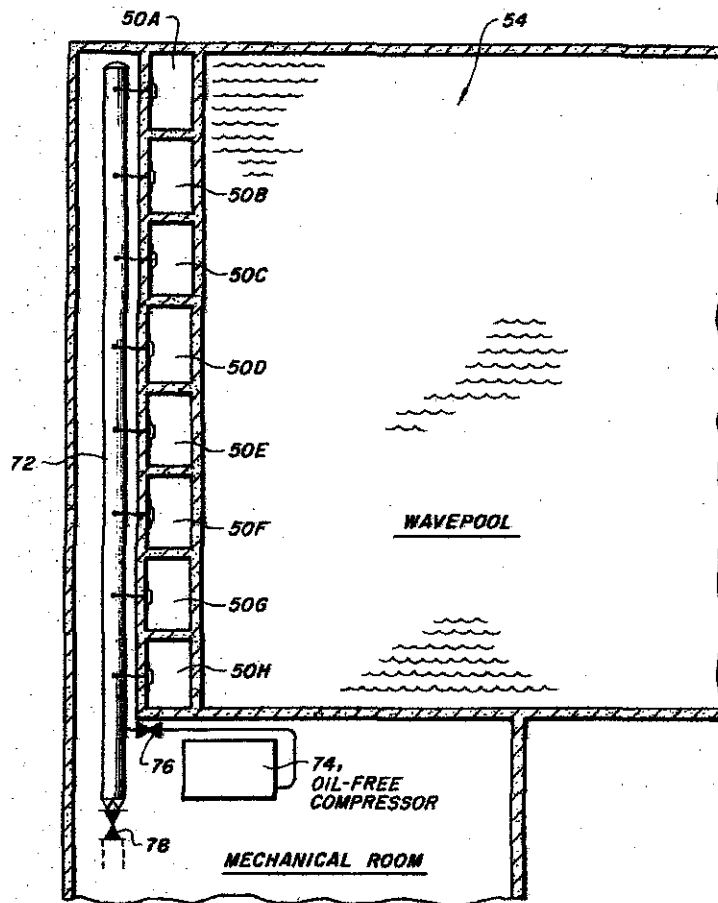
Cross-sectional plan view showing a multiple section caisson implementation
